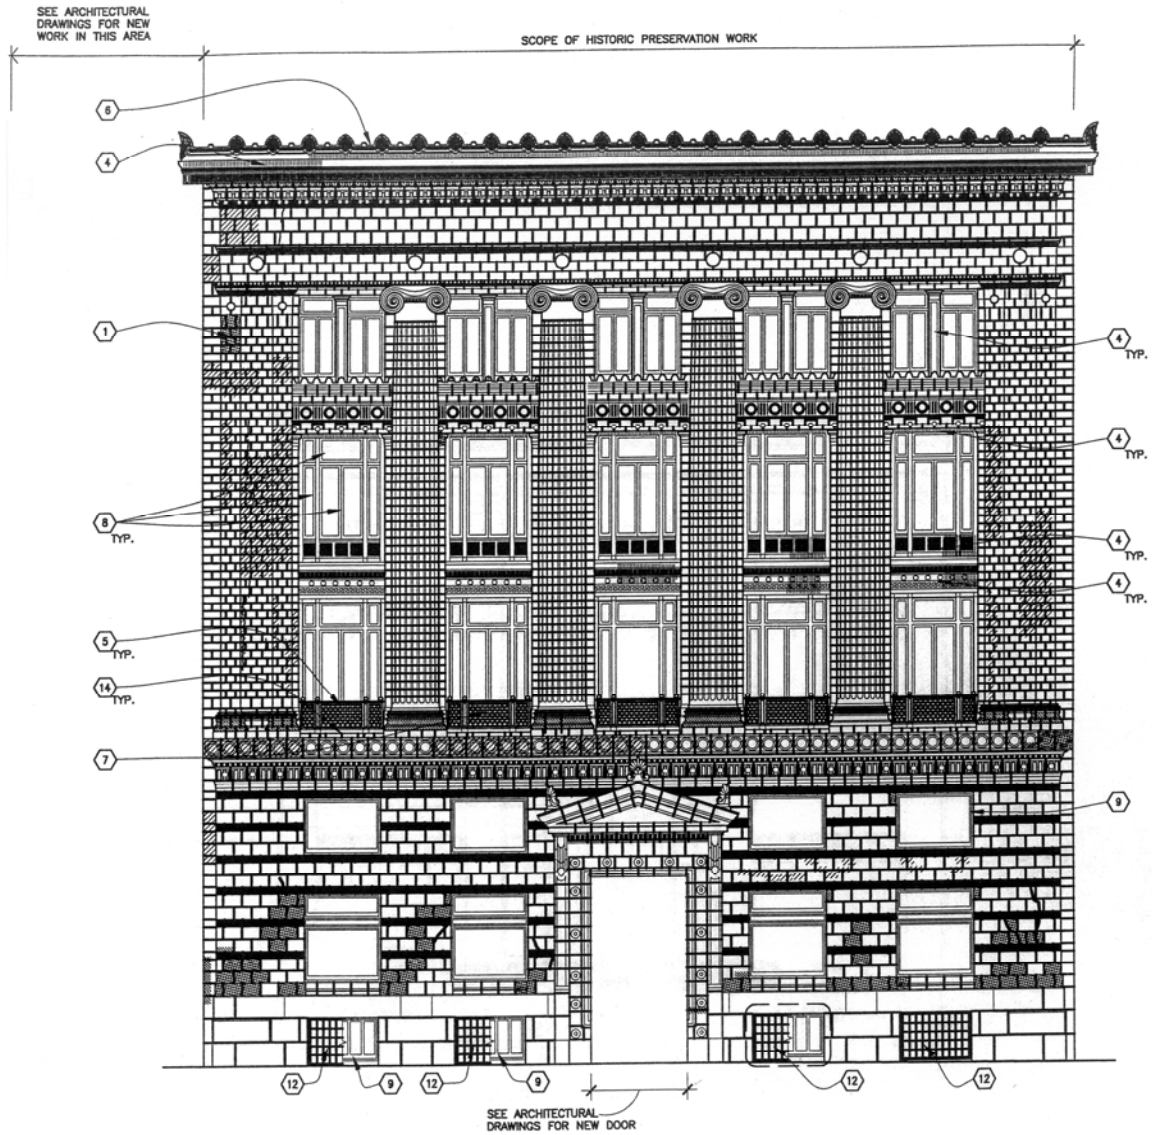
South (front) elevation of 50 Oak Street (NTS).
